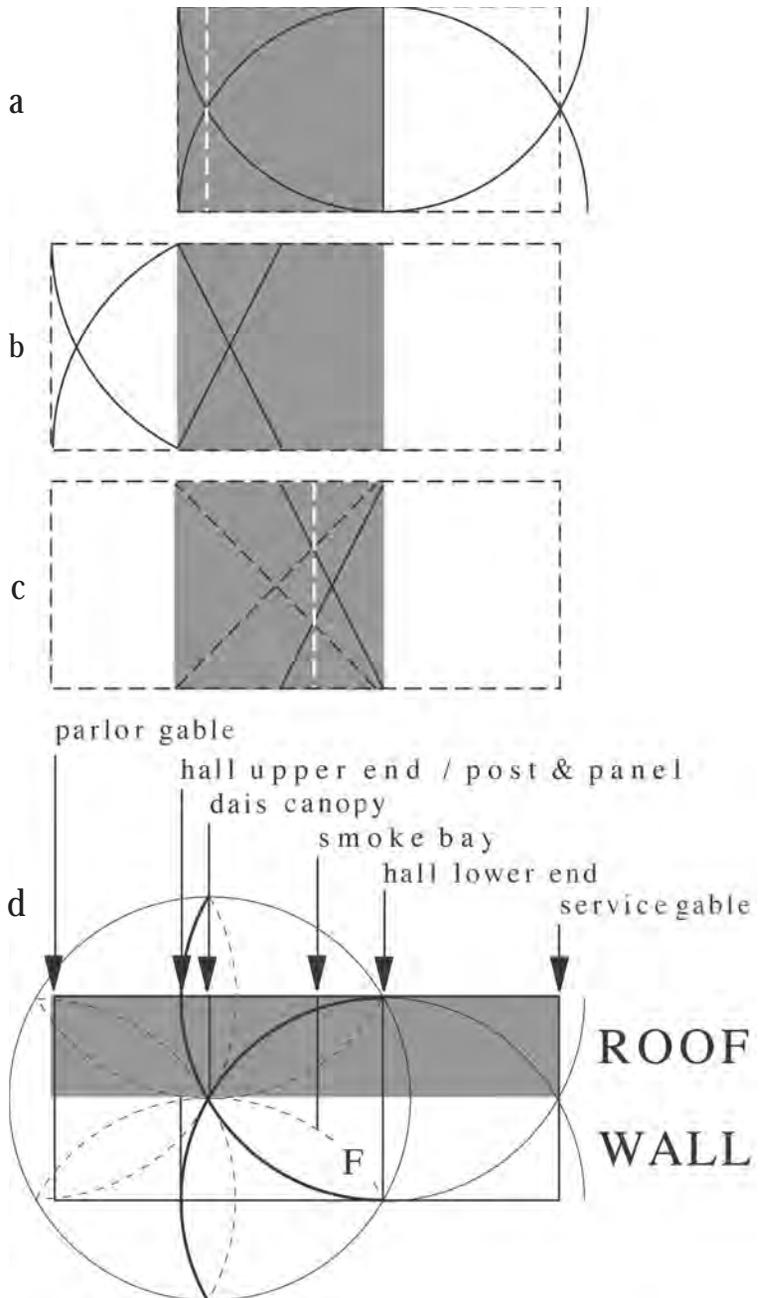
DEVELOPING GWERNFYDA'S PLAN AND LONG SECTION.
